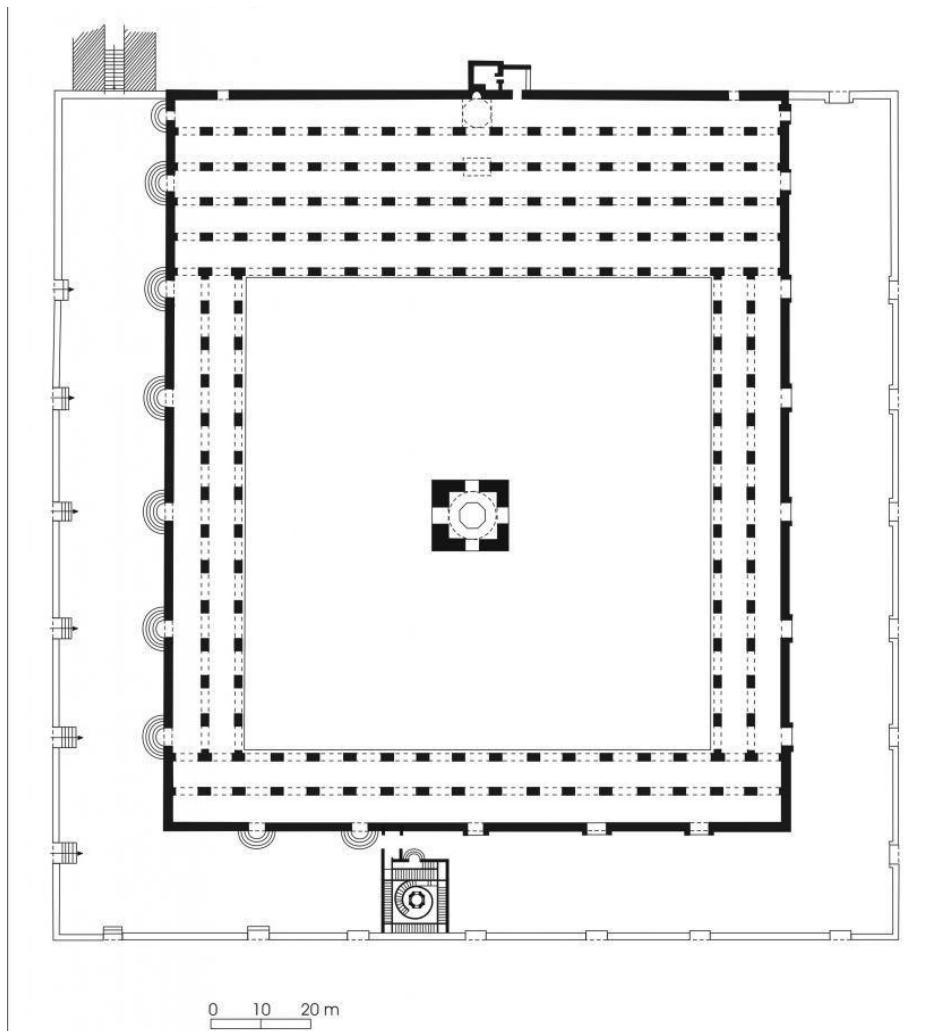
Floor plan of Ibn Tulun's Mosque in Cairo
